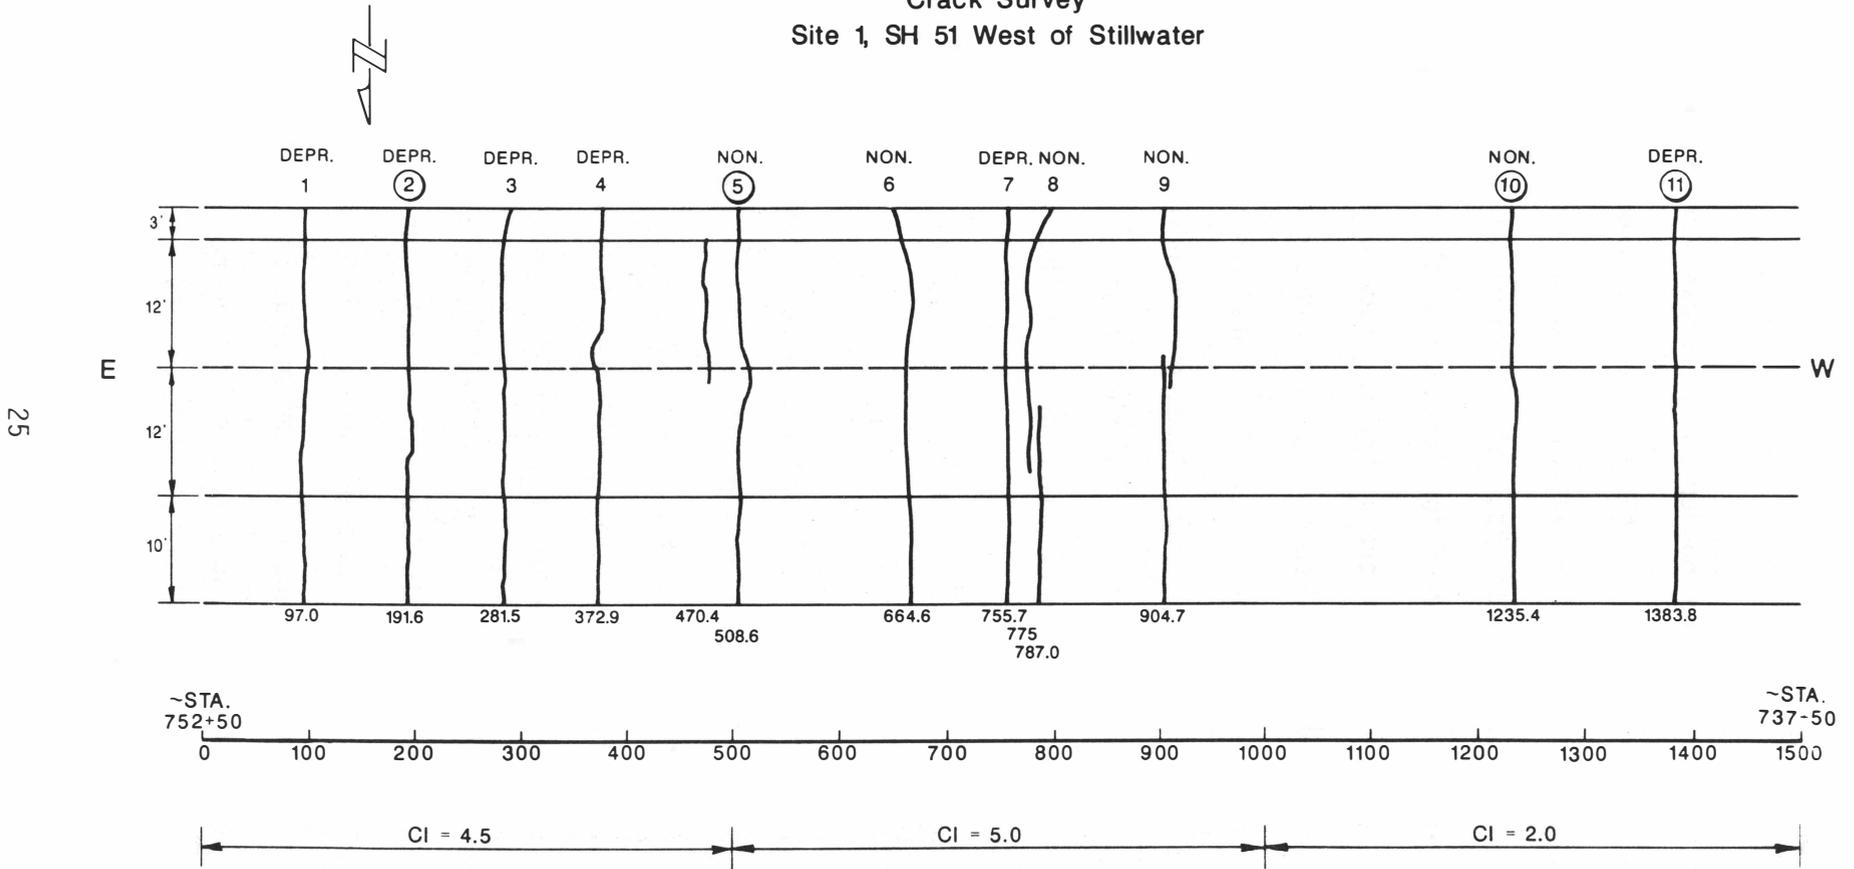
Typical Crack Survey Results for 1000-Ft Field Study Section
